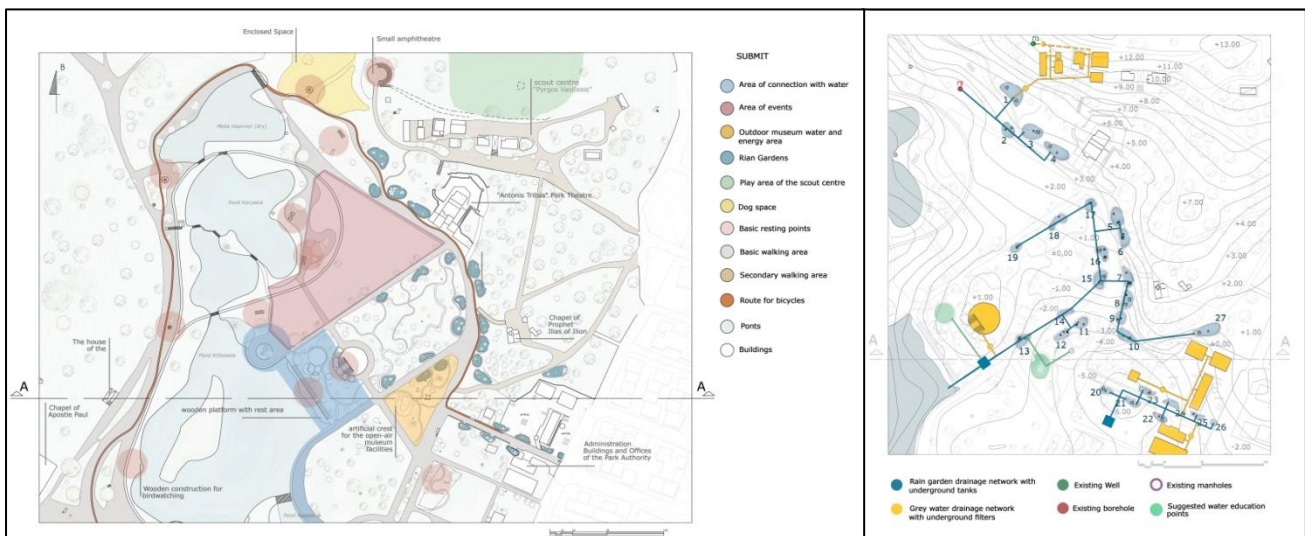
(left) Master plan of the proposal, Figure11.(right) Water management diagram. (source: created by the author)
